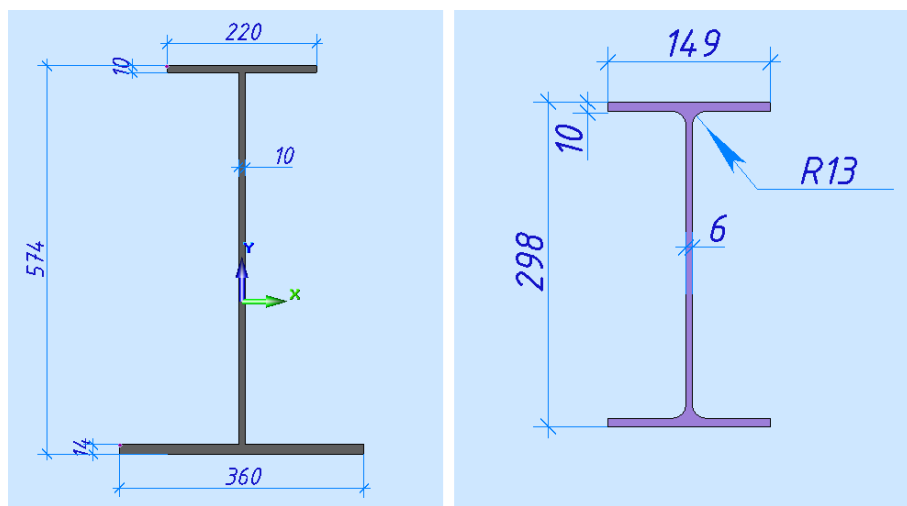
Primary beam (on left) and secondary beam (on right) cross-section
